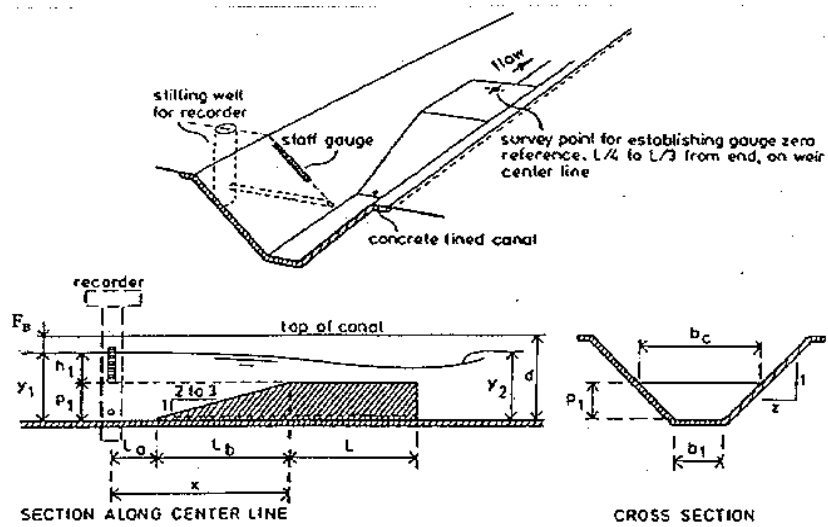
Specifications for long-throated ramp flume in concrete ditches
